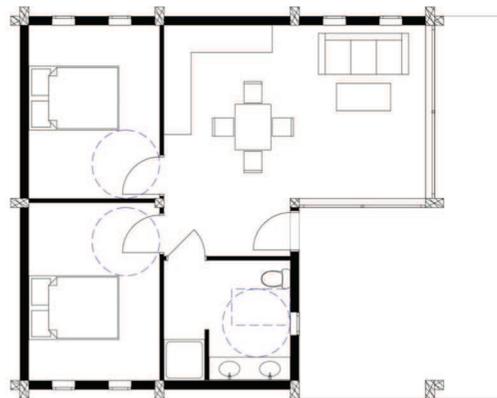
Plan cottage 2 (source SALTl Architecte)
